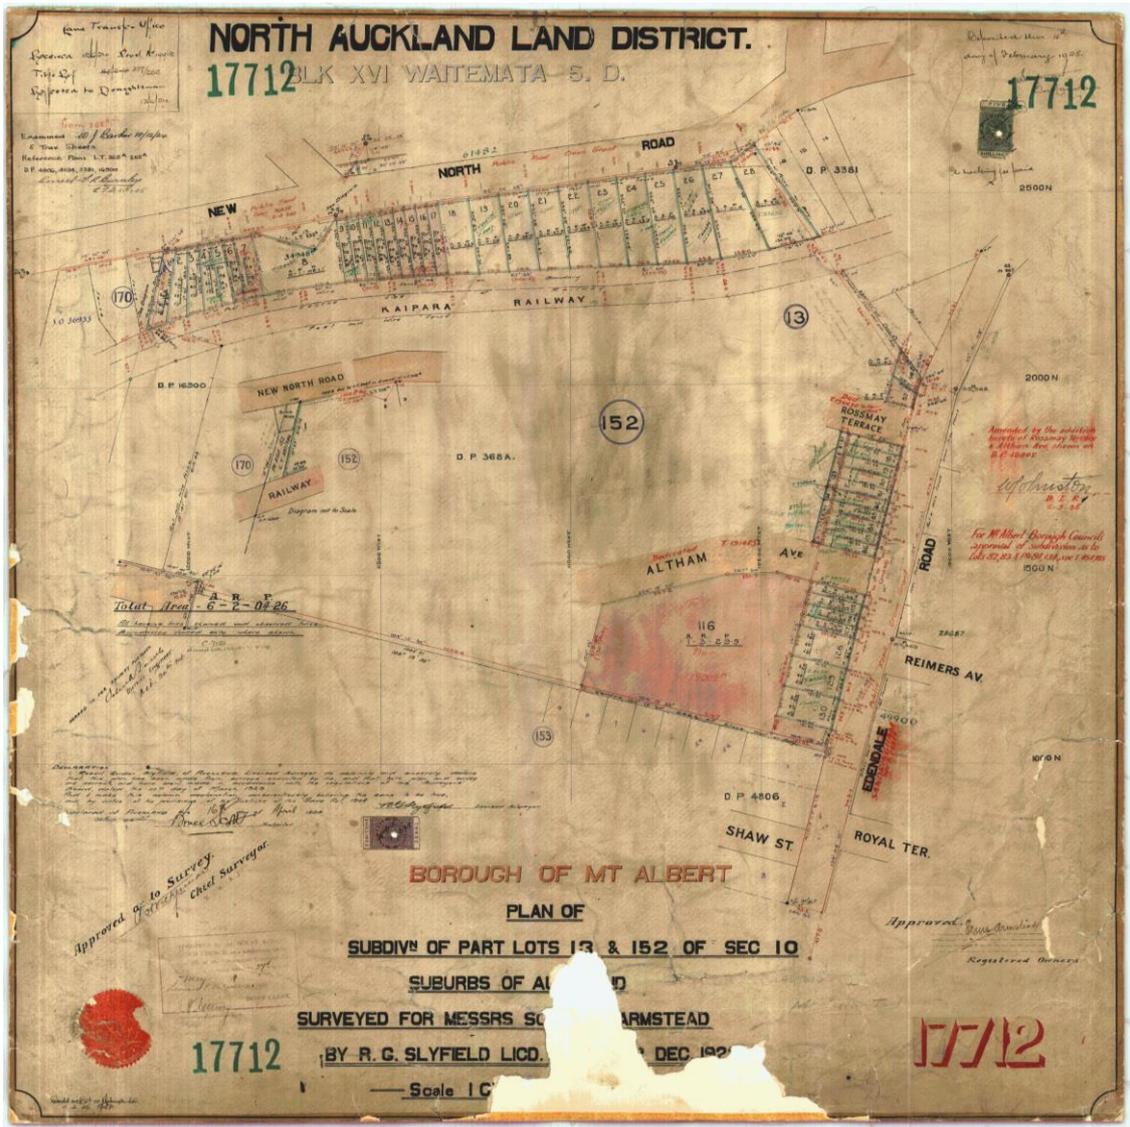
DP 17712 Subdivision for James Armstead, deposited 1925; showing extent of the estate north on New North Road. The site of Rugby Buildings, lots 79-77 is on the corner of Rossmay Terrace and the then Edendale Road. (See detail below.)
